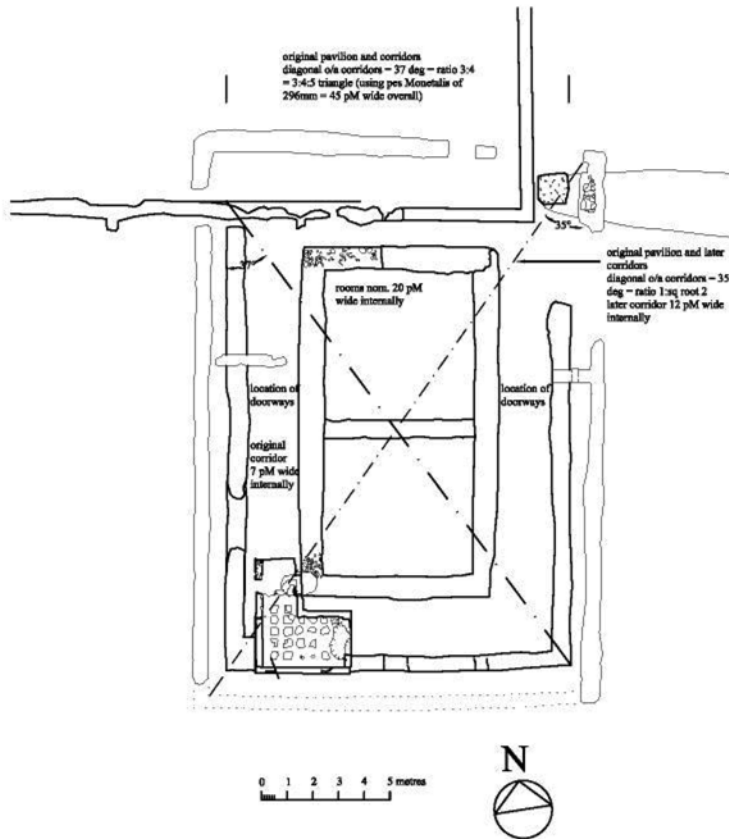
Minster Roman villa – suggested setting out of east pavilion (Building 4).
